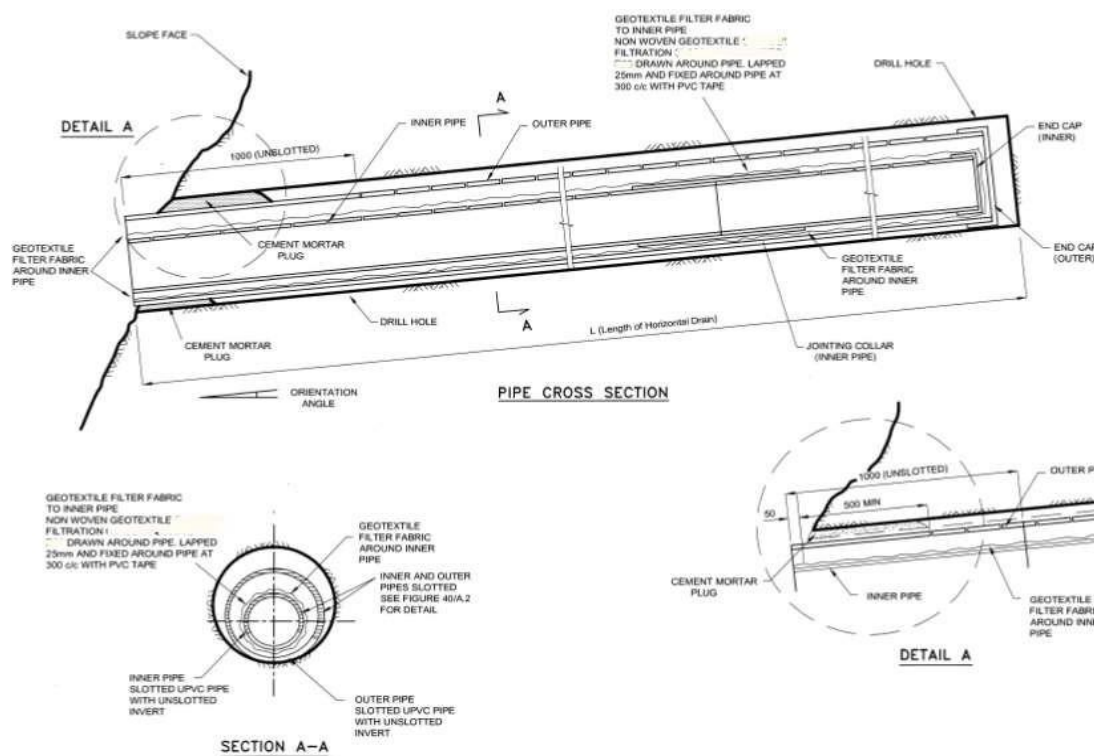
Type 3 – Horizontal Drain Detail
